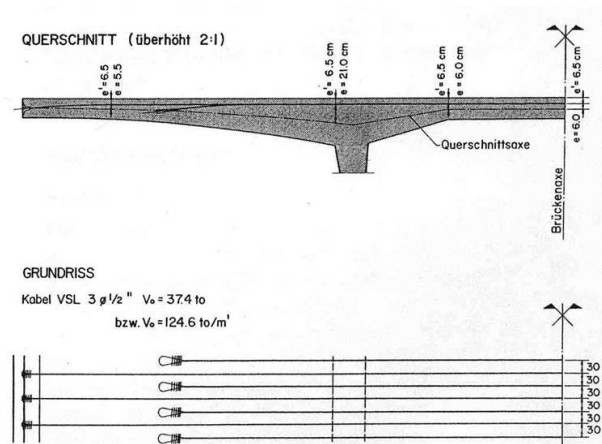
Prestressing Cable Arrangement<sup>15</sup>
